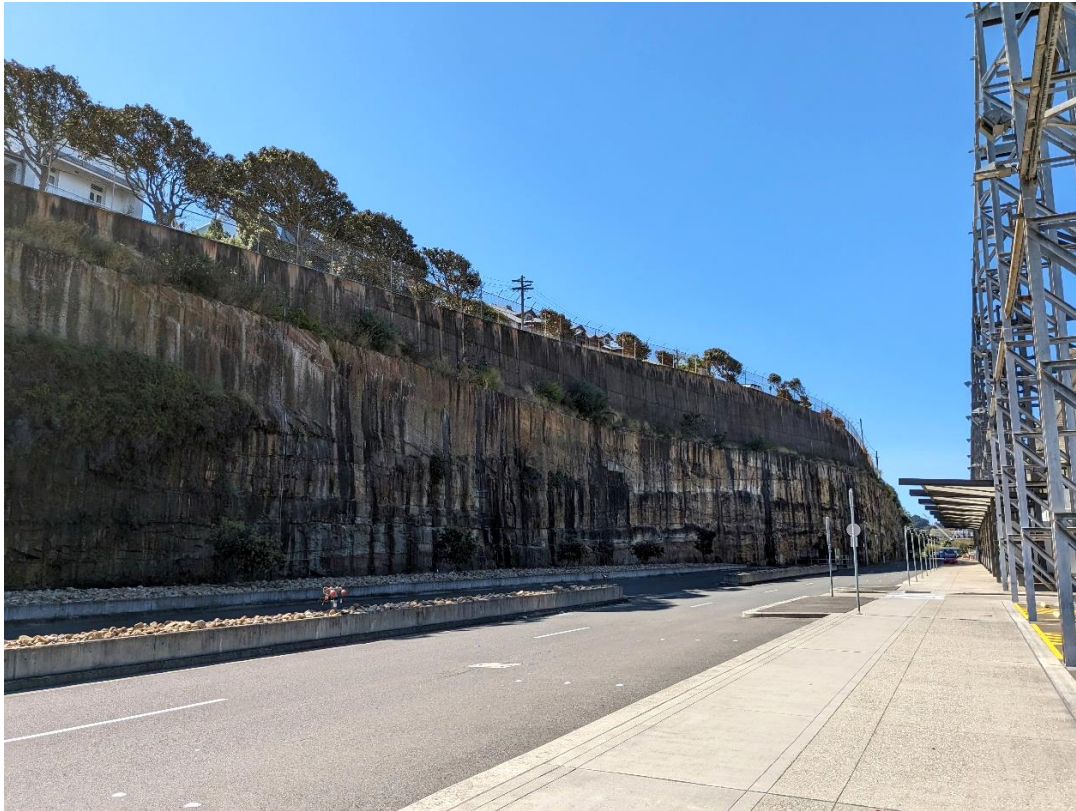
View looking east along Robert Street and the sandstone cliff face, near the White Bay Cruise Terminal car park (Source: Worley Consulting, 2023)
